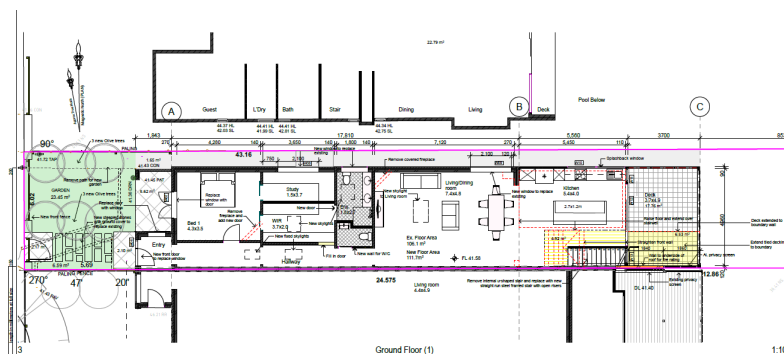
proposed deck extension with fire rated wall and aluminum privacy screen (conditioned to be deleted)
